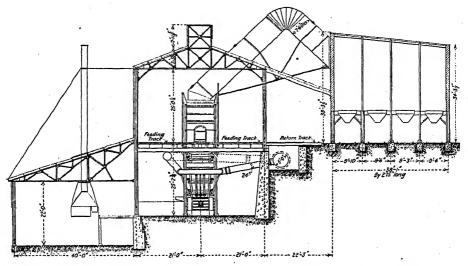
Vertical cross-section through blast-furnace-building, Anaconda, Montana.
